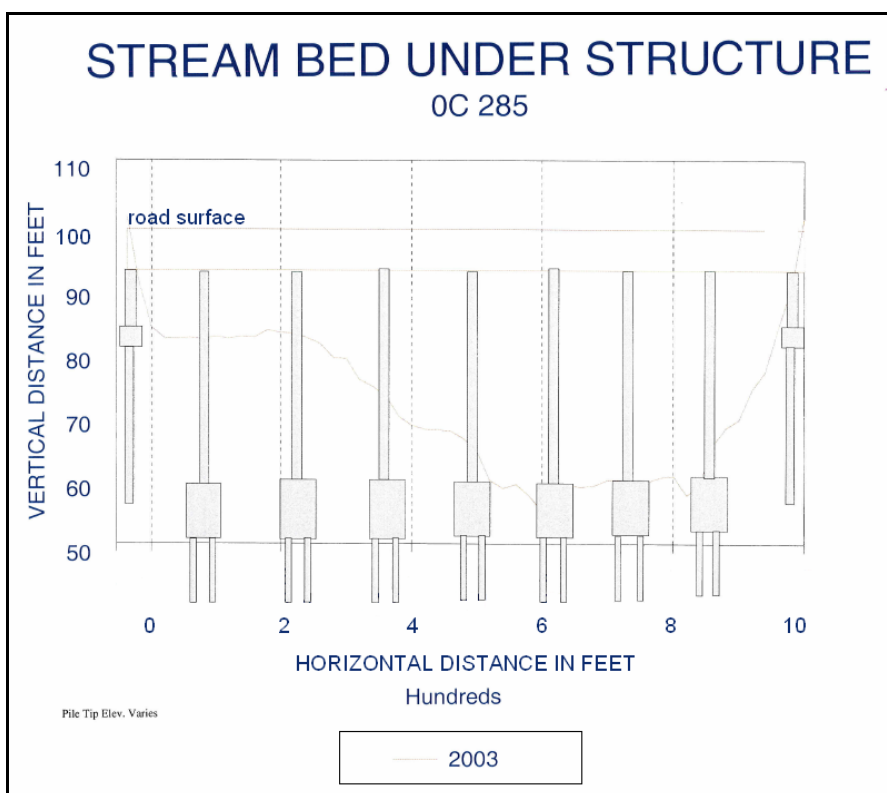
Underwater Inspection Report, Colorado River Bridge Profile, 2003
